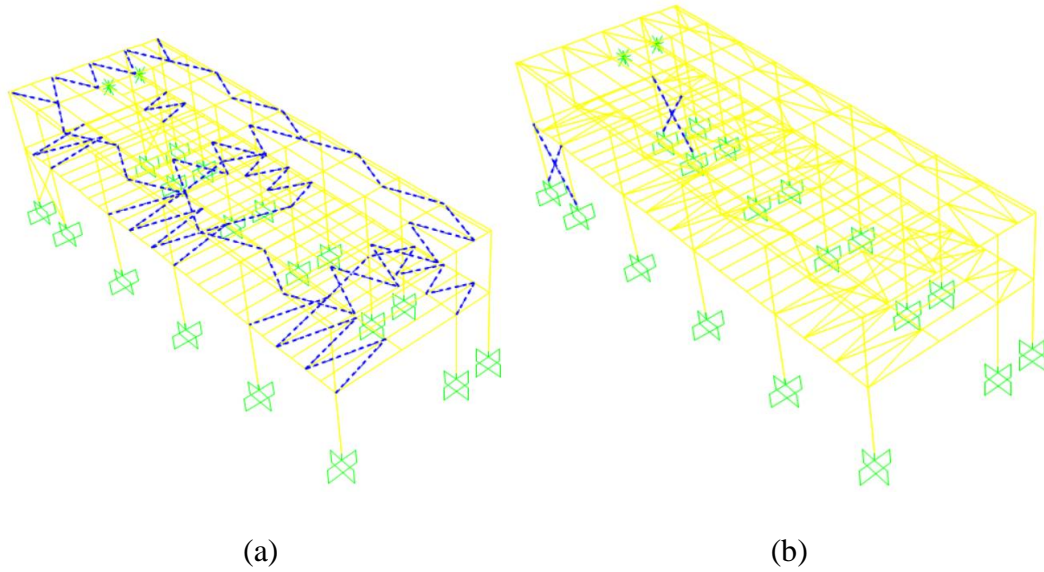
Bracing member groups for the 545-member steel frame: (a) horizontal braces (BR1), (b) vertical braces (BR2).
